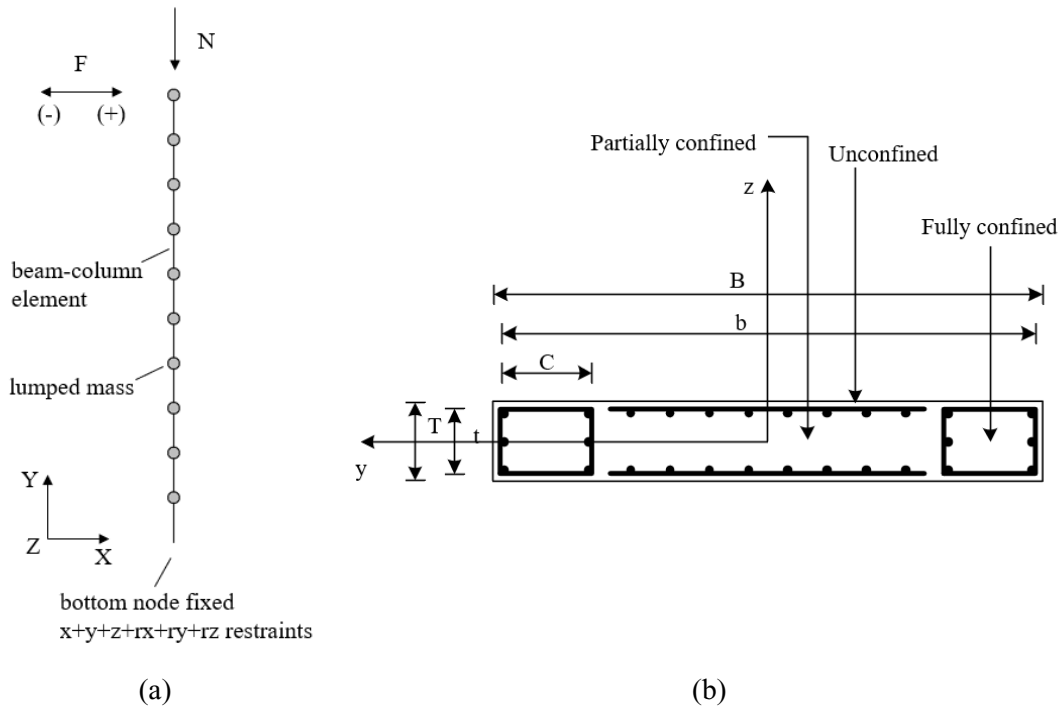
1D beam-column model for the slender wall: (a) numerical model (b) cross-section ‘flxw’ in ADAPTIC
